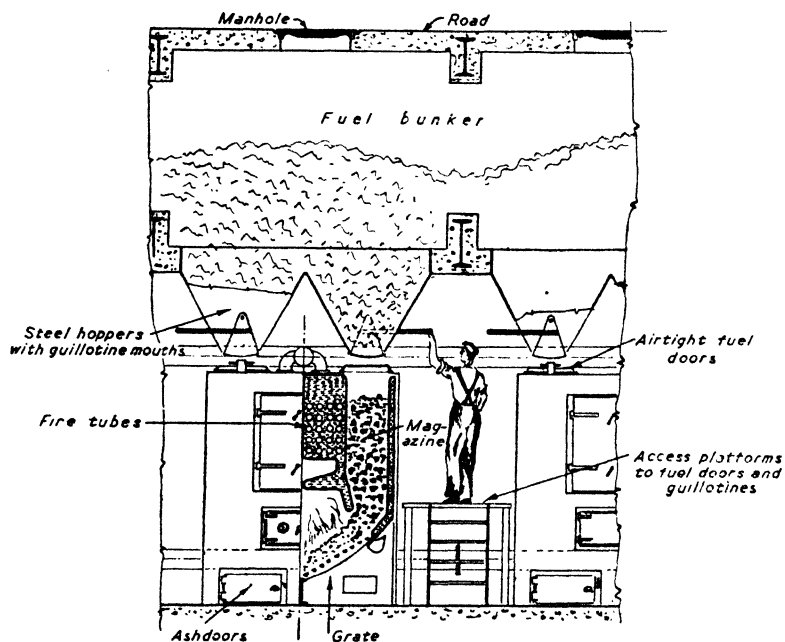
SECTION OF BOILER HOUSE SHOWING GRAVITY FEED BOILERS AND OVERHEAD BUNKERS
